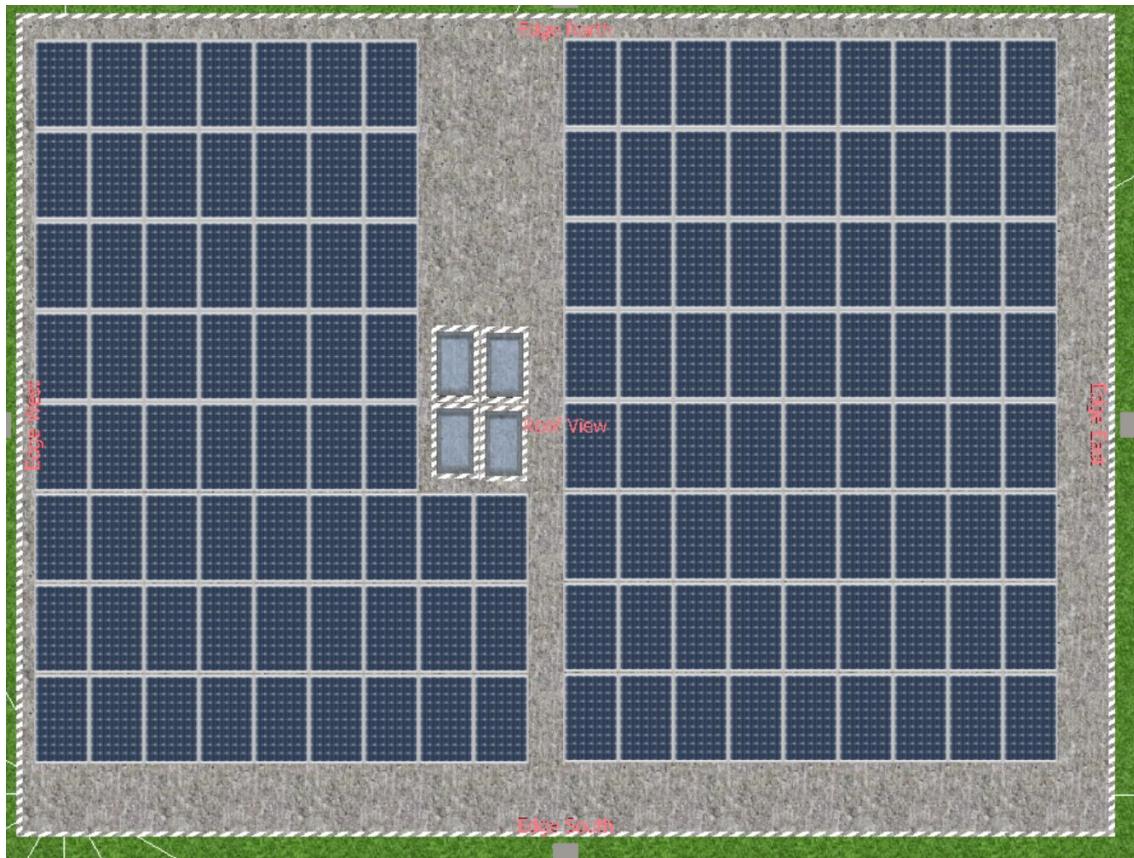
Proposed layout of the roof-mounted PV array
